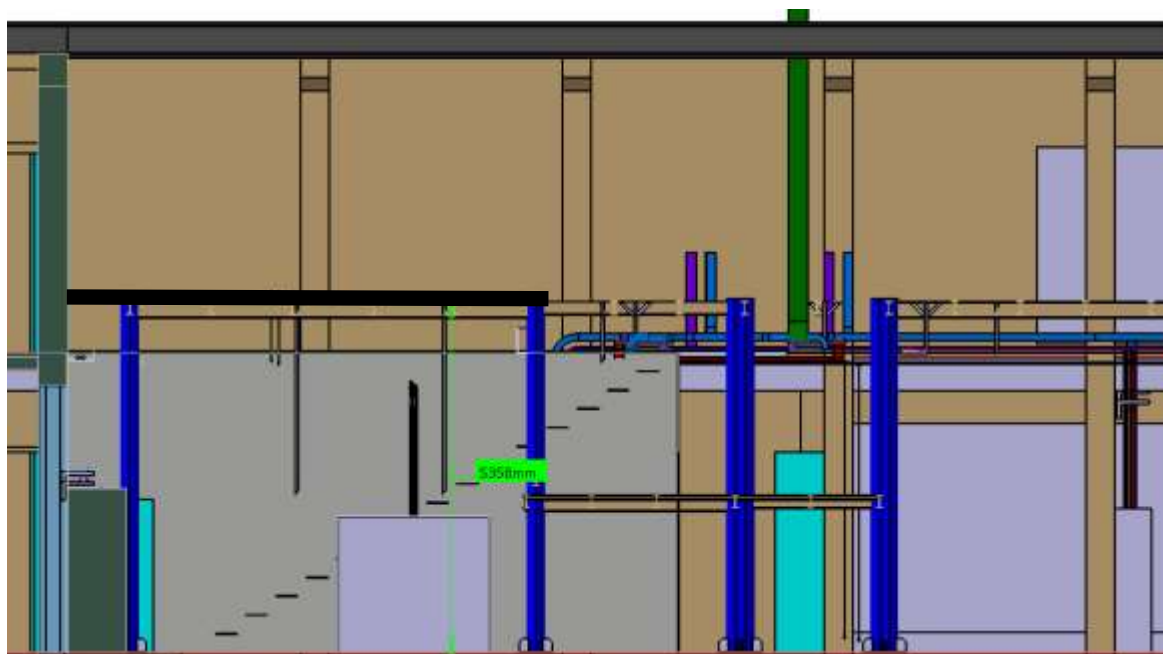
Elevation of Cable route highlighted in dark inside DNB lab ITER India Lab Building
